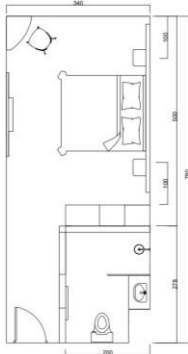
Layout sketch of Double Murphy Room (Azkia, 2023)
